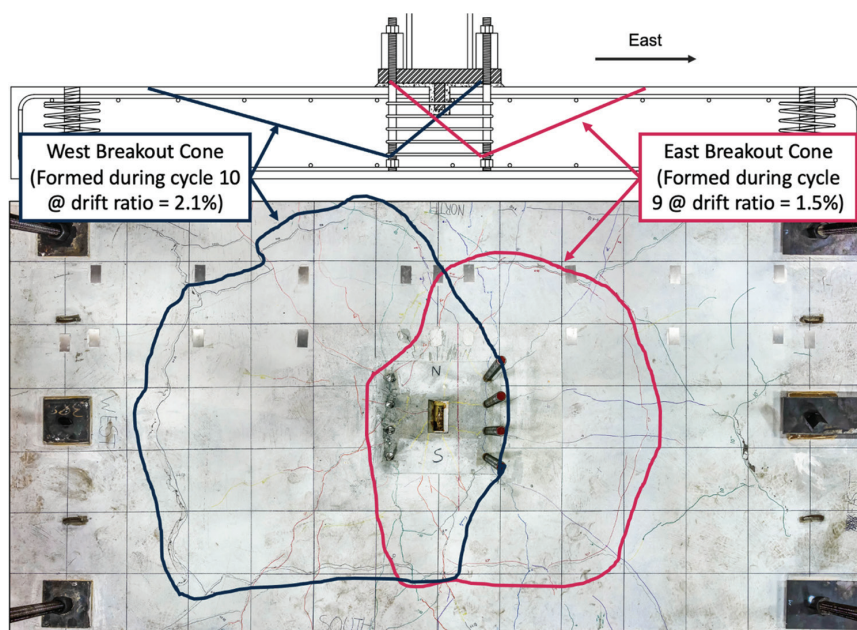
Idealized cone geometry shown in elevation and observed cone geometry intersecting top surface in plan view, with 12 x 12 in. (305 x 305 mm) grid Specimen M01.
